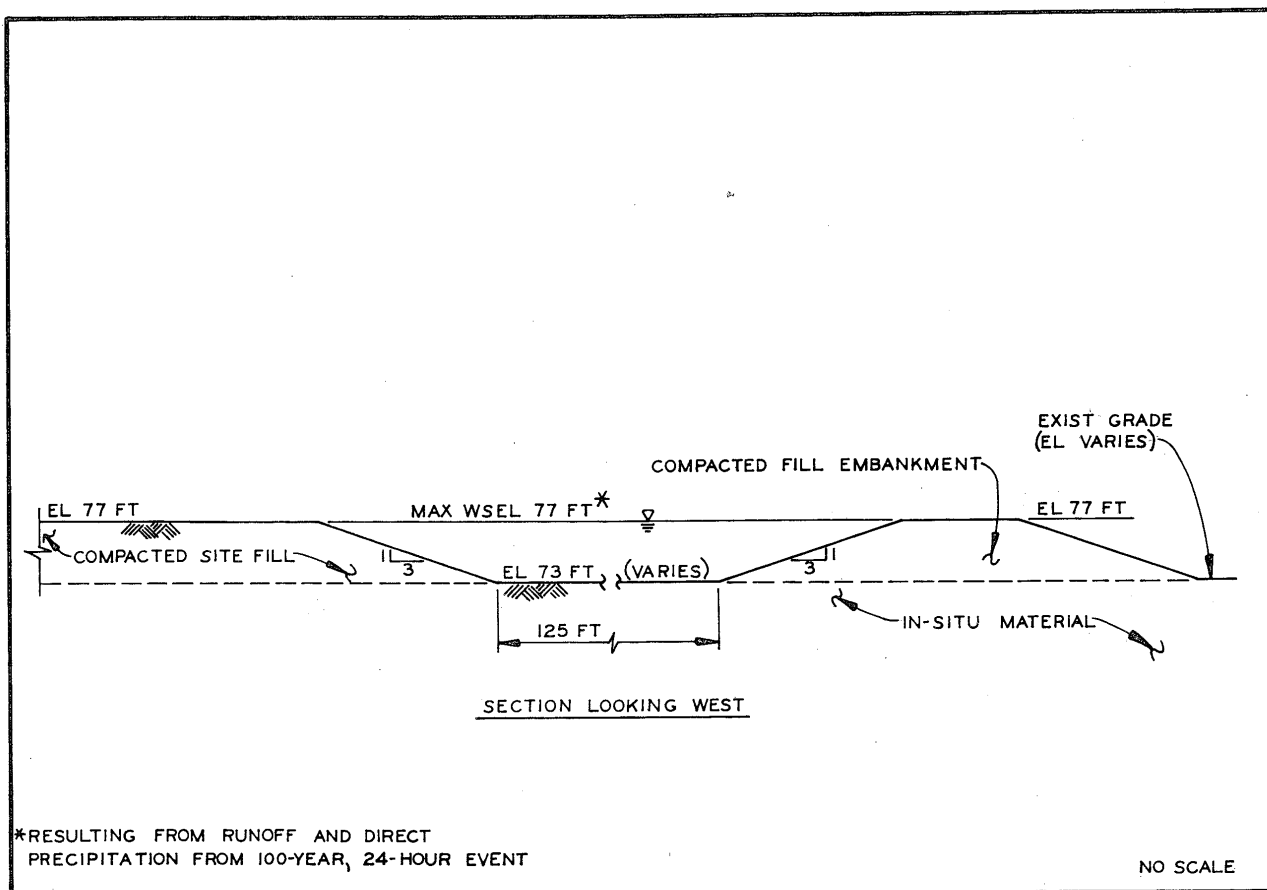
CONSTRUCTION LAYDOWN AREA
